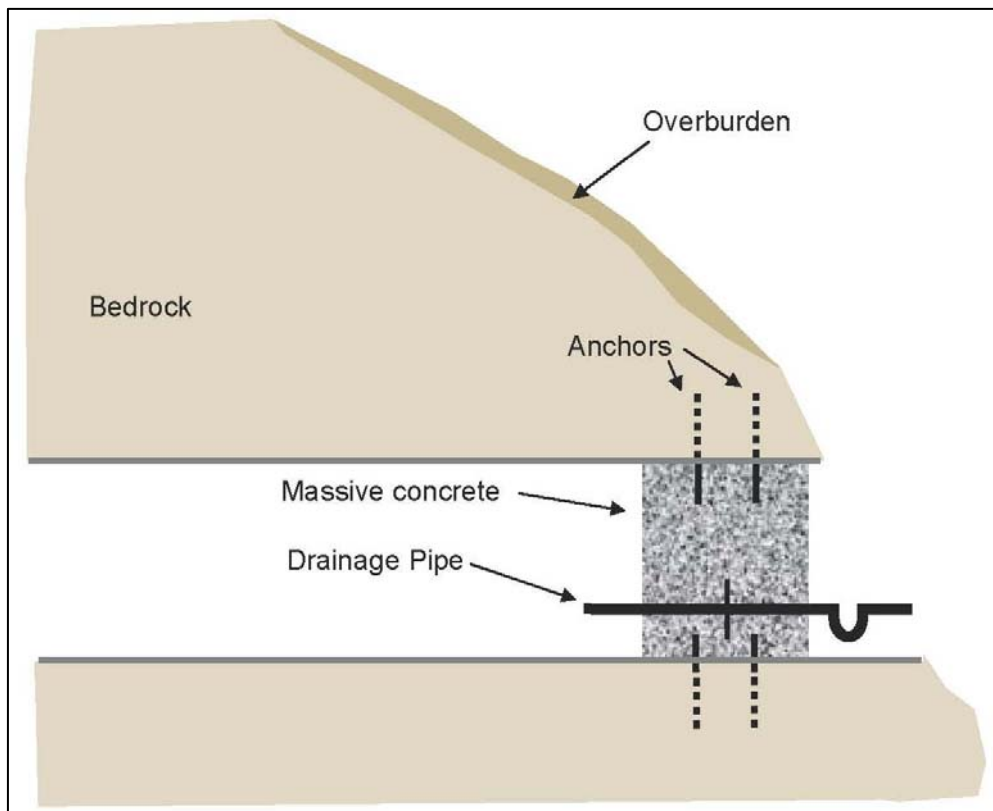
Conceptual Bellekeno 625 Adit Bulkhead
